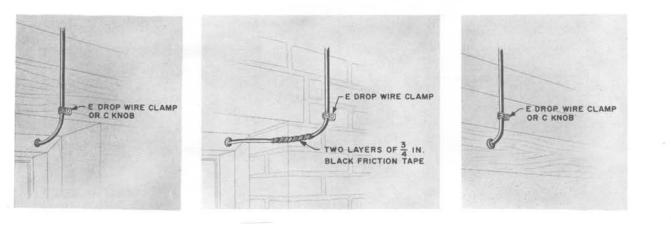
Last Attachment (Building Entrance Hole Slopes Upward from Outside)
